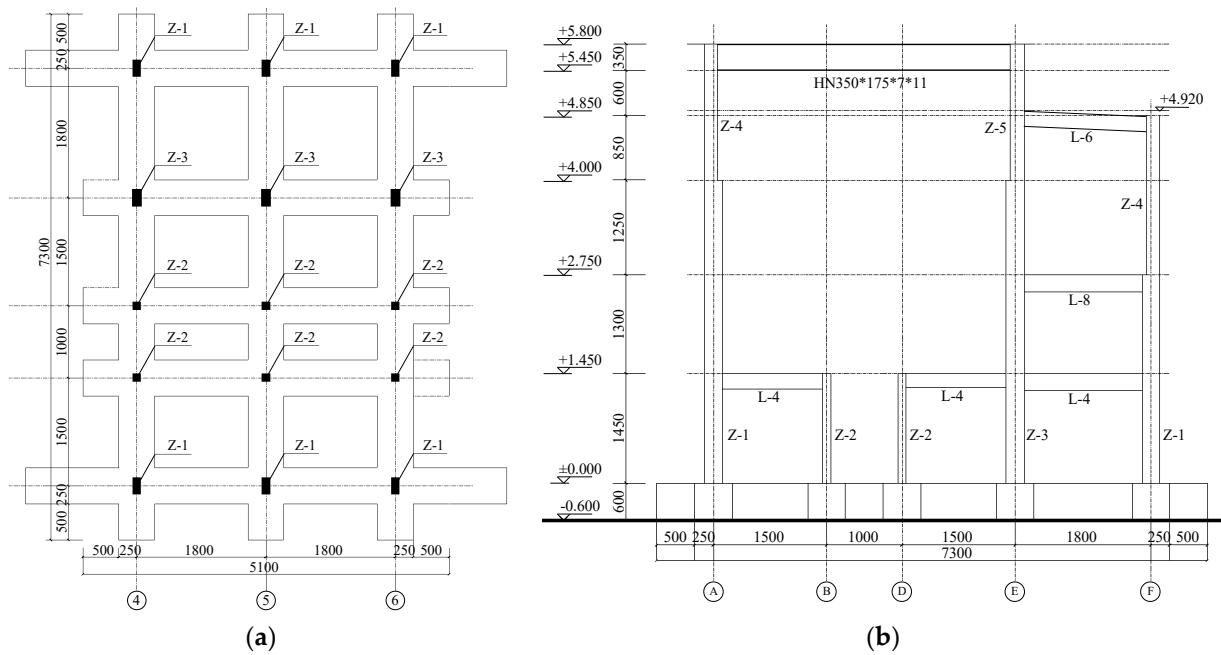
Plane layout and vertical layout of model structure. (a) ± 0.00 planar graph of ground beam. (b) Six-axis elevation drawing.
